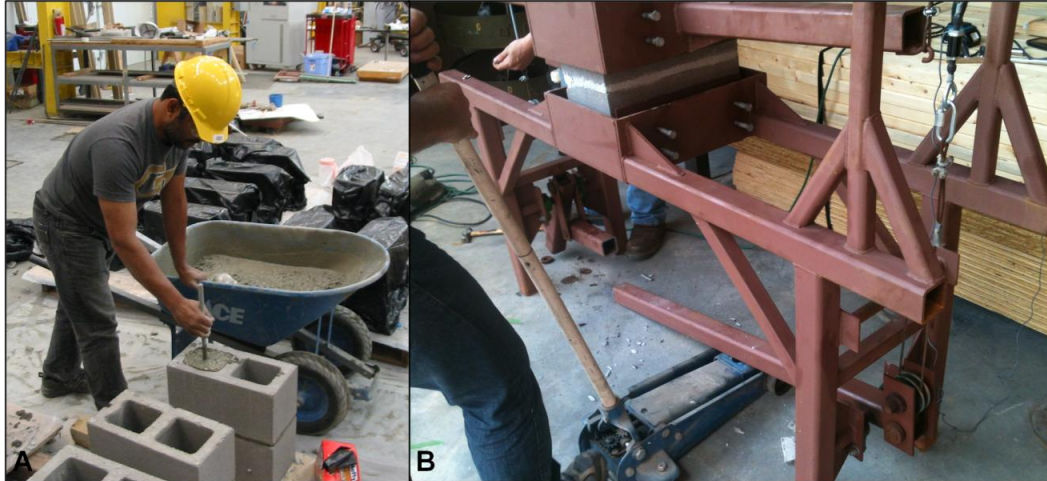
Masonry-mortar bond specimen (a) construction and (b) testing
